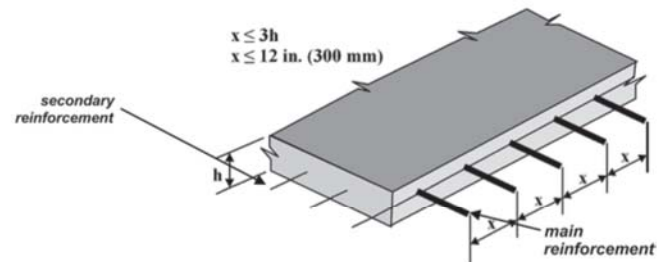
Maximum spacing between flexural reinforcement in solid slabs.
